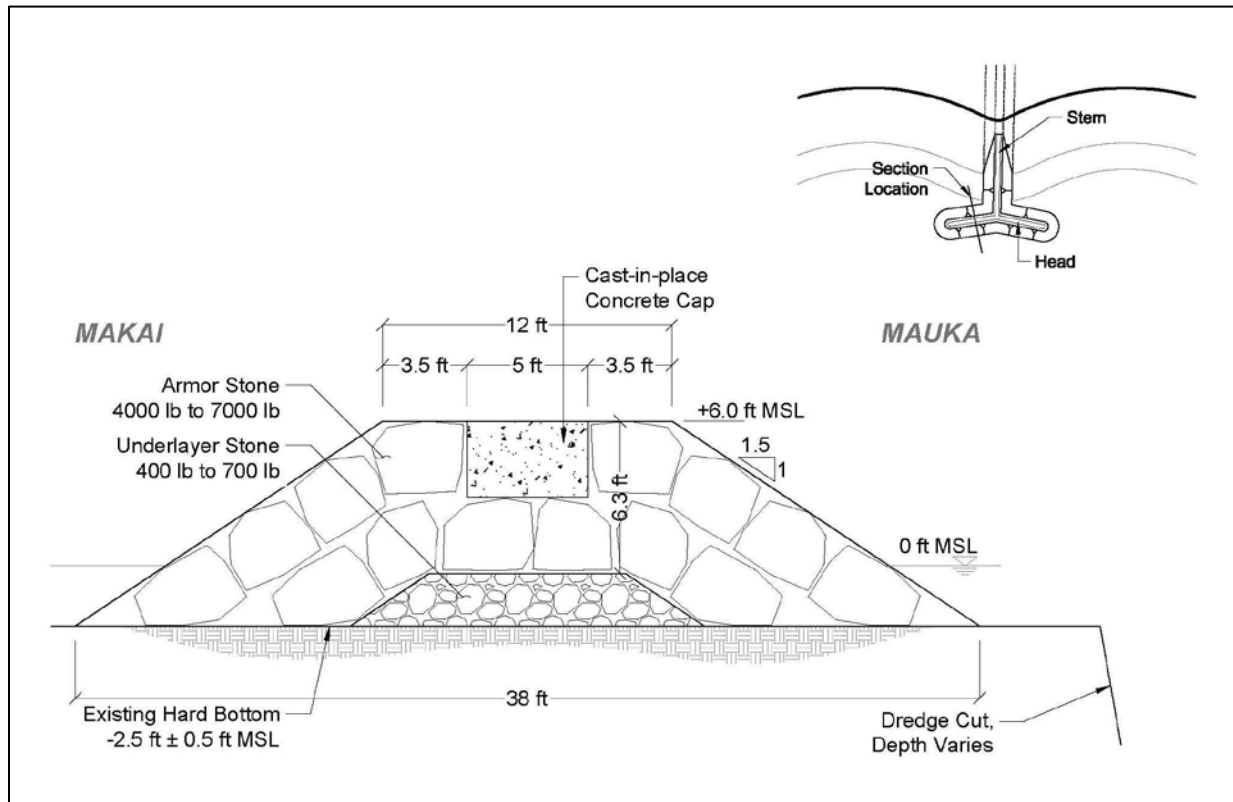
Section views of proposed groin heads – Halekūlani beach sector
